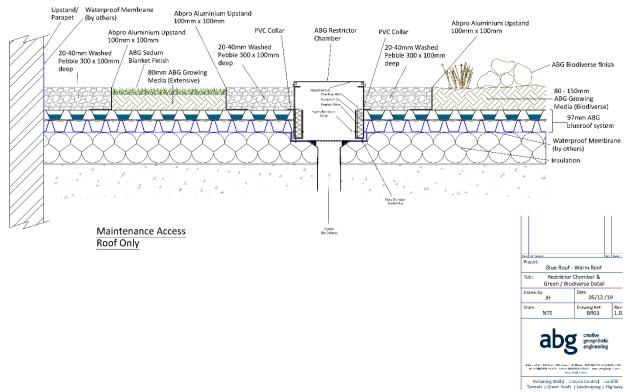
Typical details provided by a specialist showing a blue roof build-up with extensive green roof
